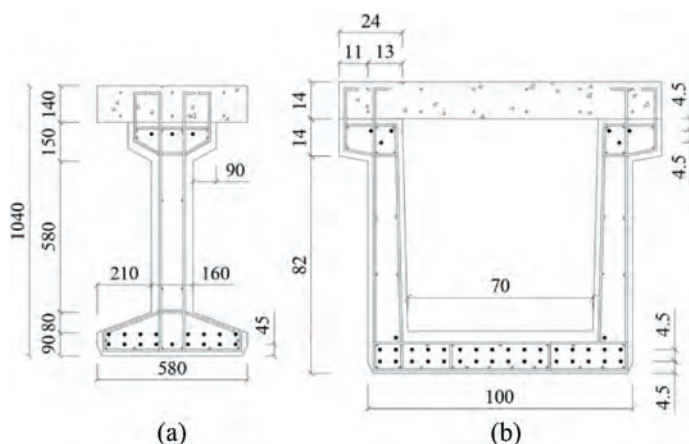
Cross-section of the beams (units in mm): (a) I-beam; (b) Box-beam (from design documentation).
